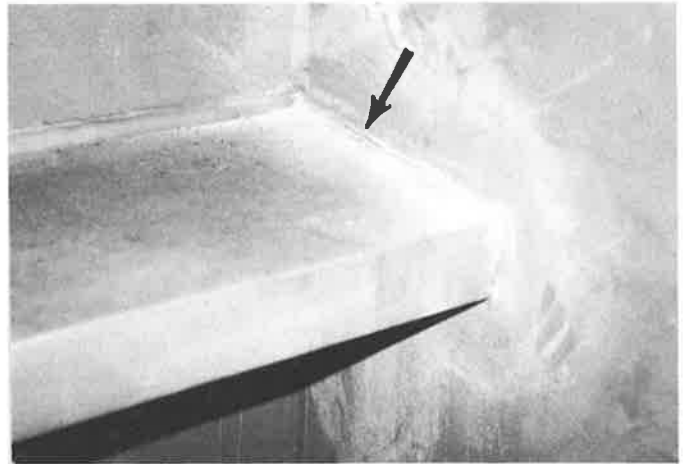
Crack in Seal Weld on Inside Face of Web of Box Cap Member
